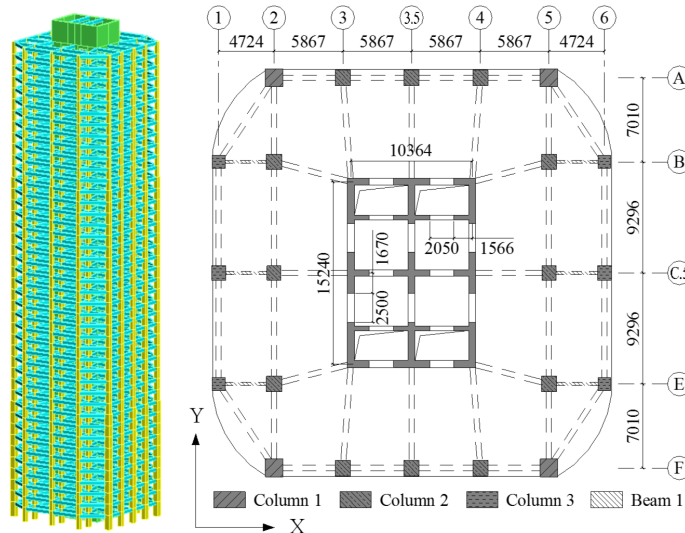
Three-dimensional view and typical layout of Building 2N (units: mm) [Lu, Xie, Guan et al. (2015)]
